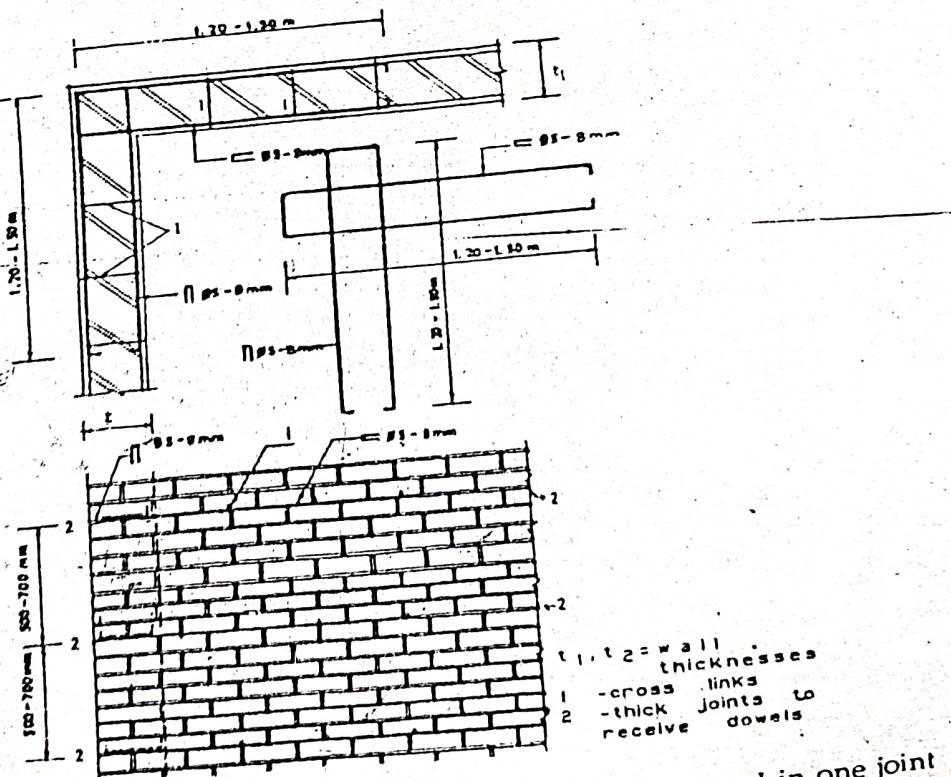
Corner-strengthening by dowel reinforcement placed in one joint
